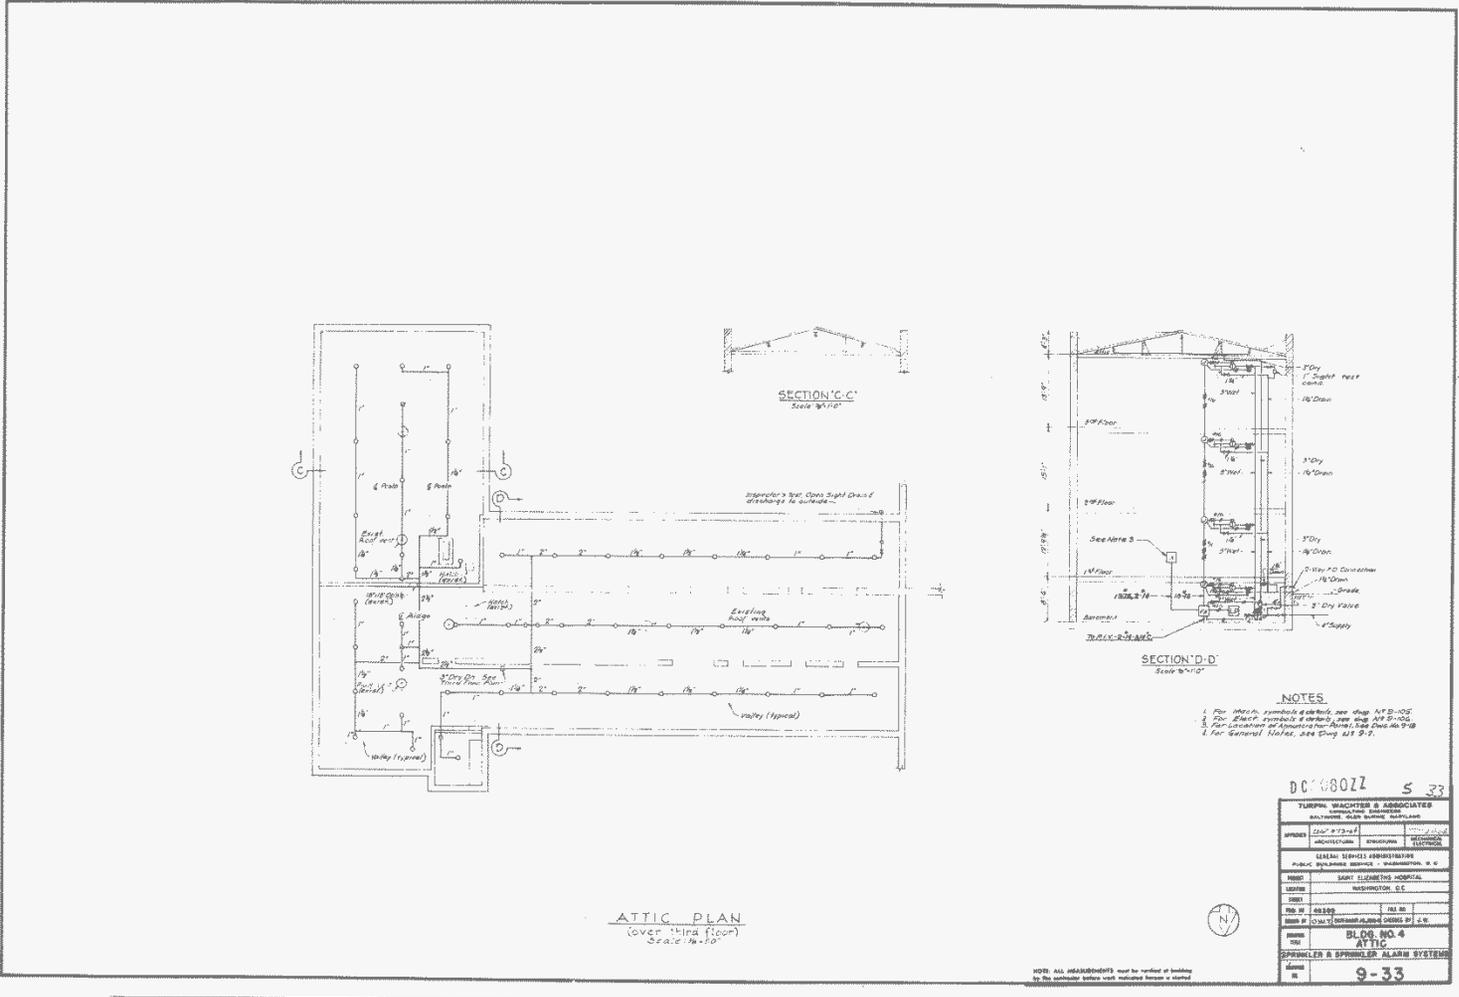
Attic plan of the East Wing outlining fire suppression system improvements, 1964. Source: GSA archives, image DC0080SE0005.
